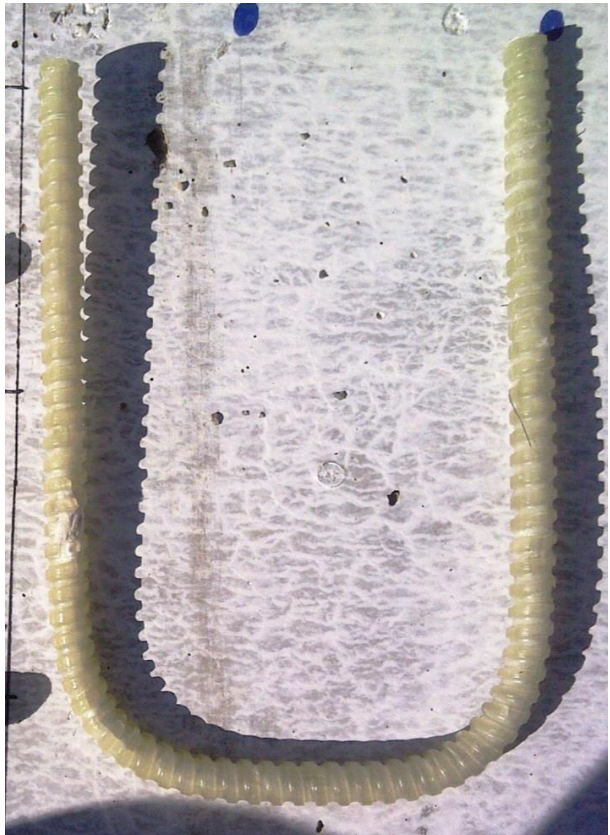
BM16-150 Close-up Photo of Failure 2
